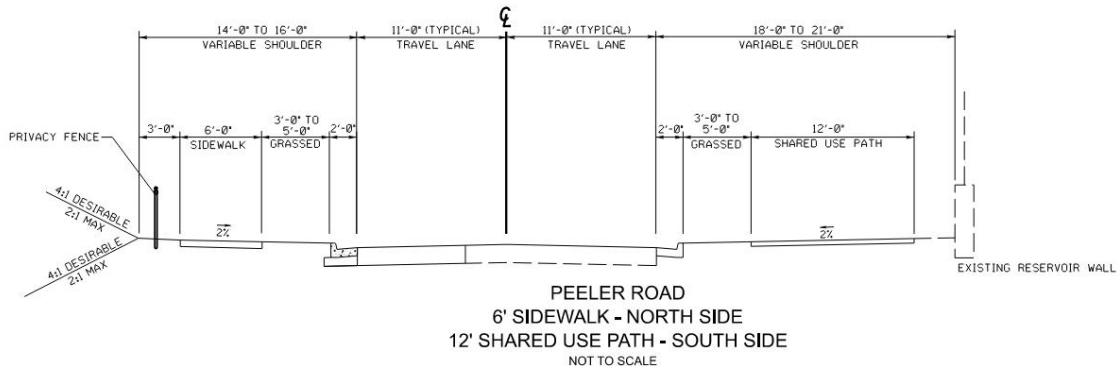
Typical Section – Shared Use Path on the south side and 6' proposed sidewalk on north side of roadway (looking east)
